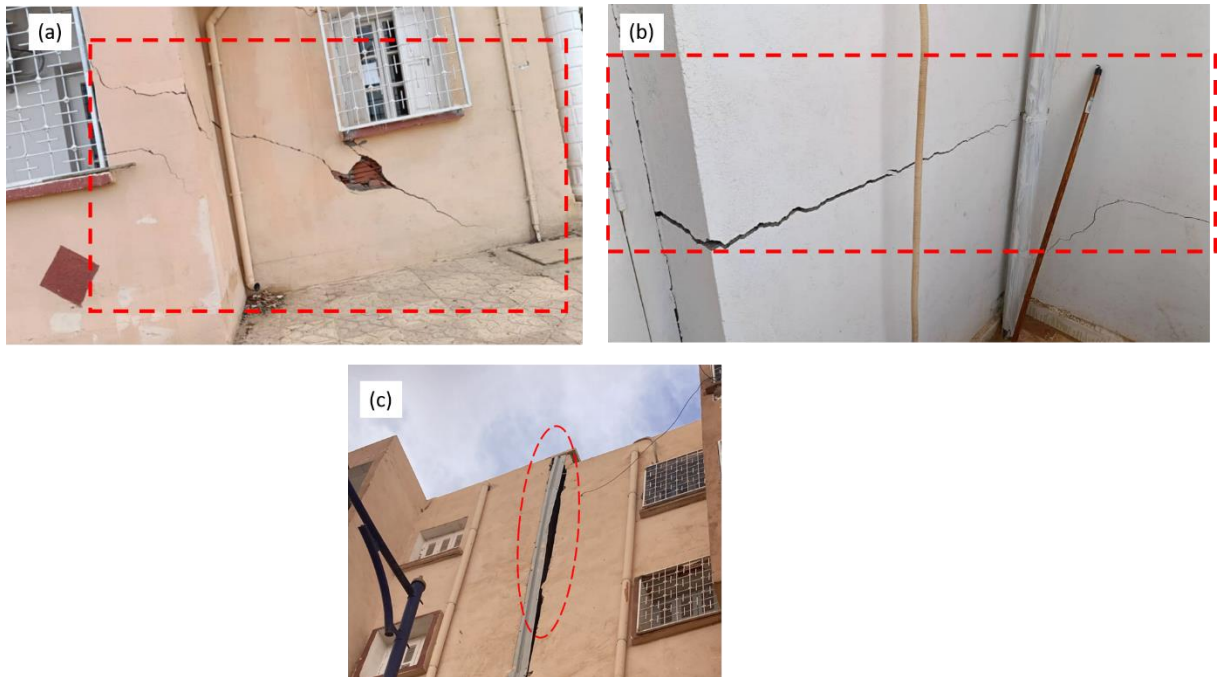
Newly observed defects in Area 4: (a) Exterior masonry cracking of building 4, (b) Interior masonry cracking of building 4, (c) Divergence at the dilatation joint between buildings 4 and 5.
